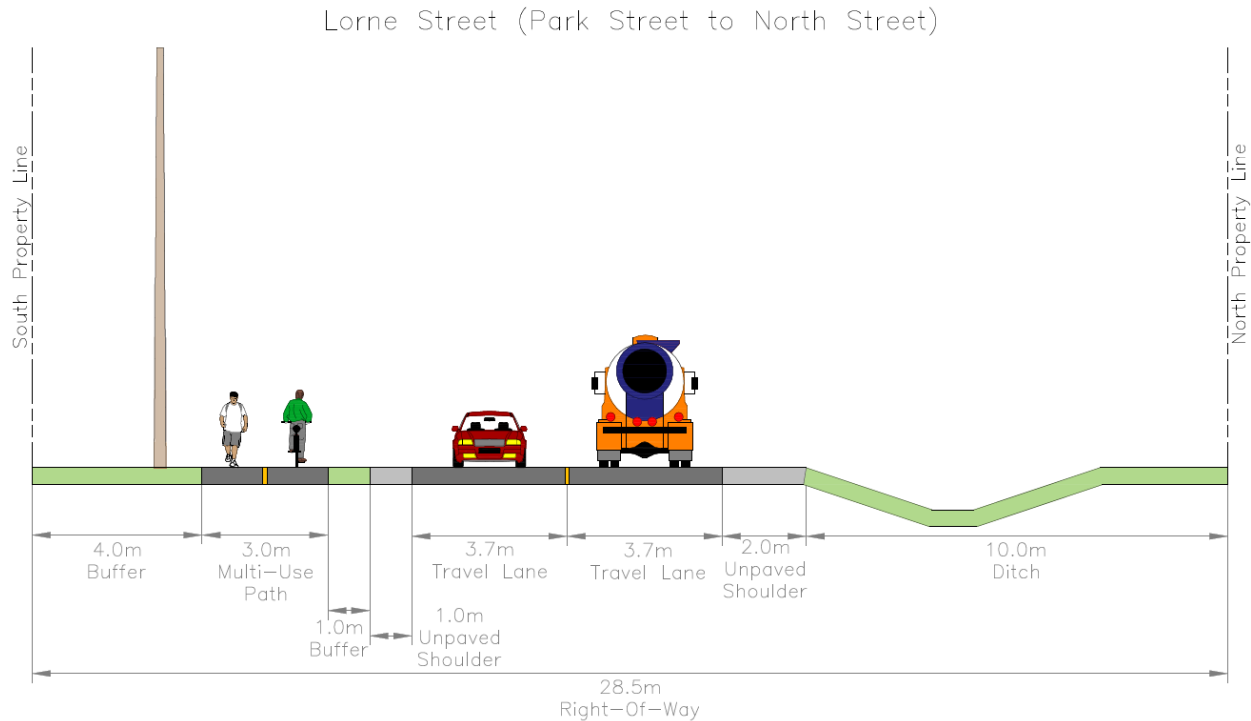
Lorne Street between North Street and Park Street, Revised Cross Section
